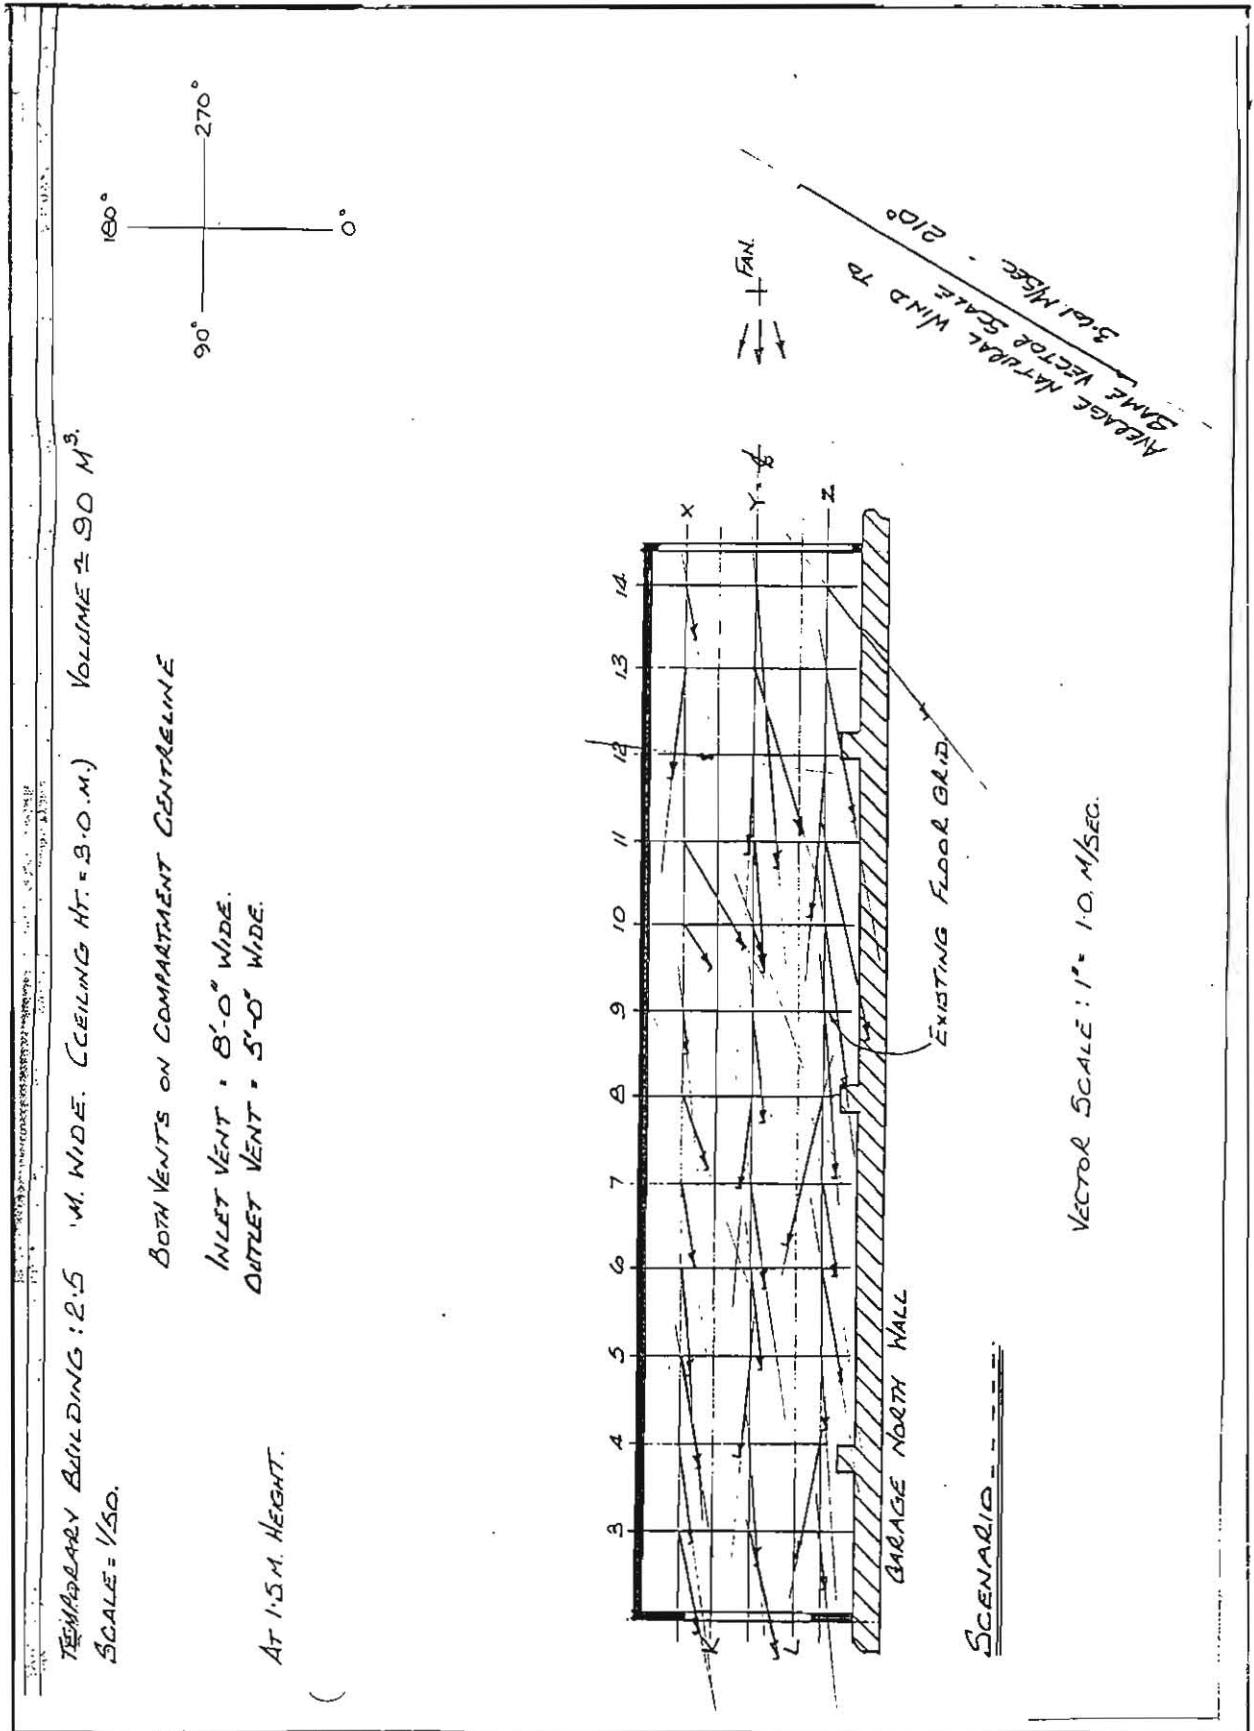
Airflow survey in 2.5 metres wide compartment: 8' 0" inlet - 5' 0" outlet.
